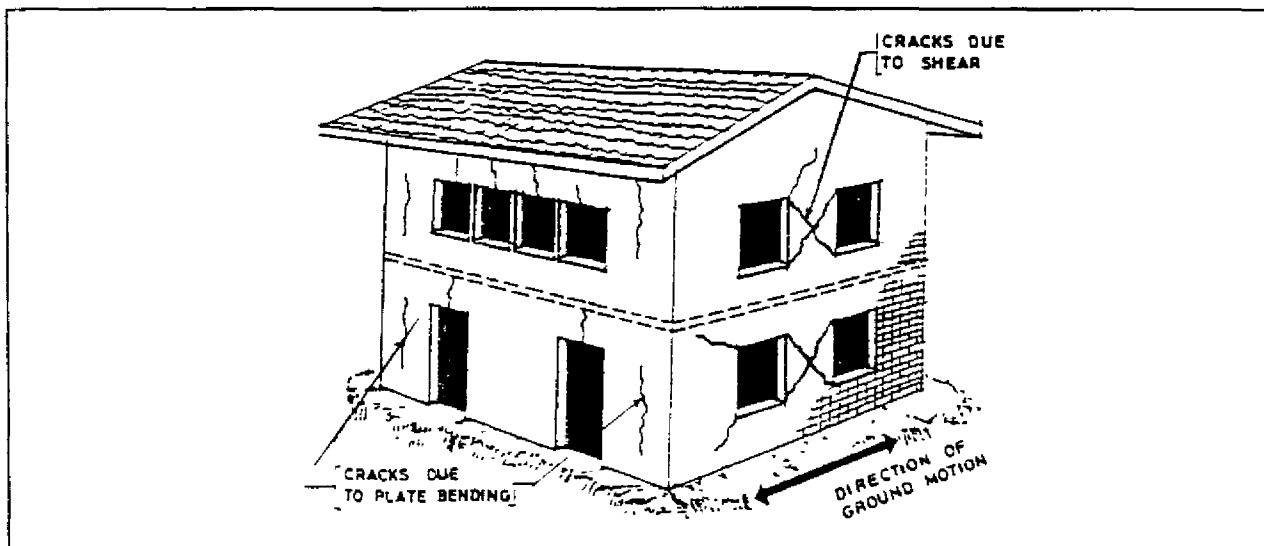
Cracking in Bearing Wall Building due to Bending and Shear
